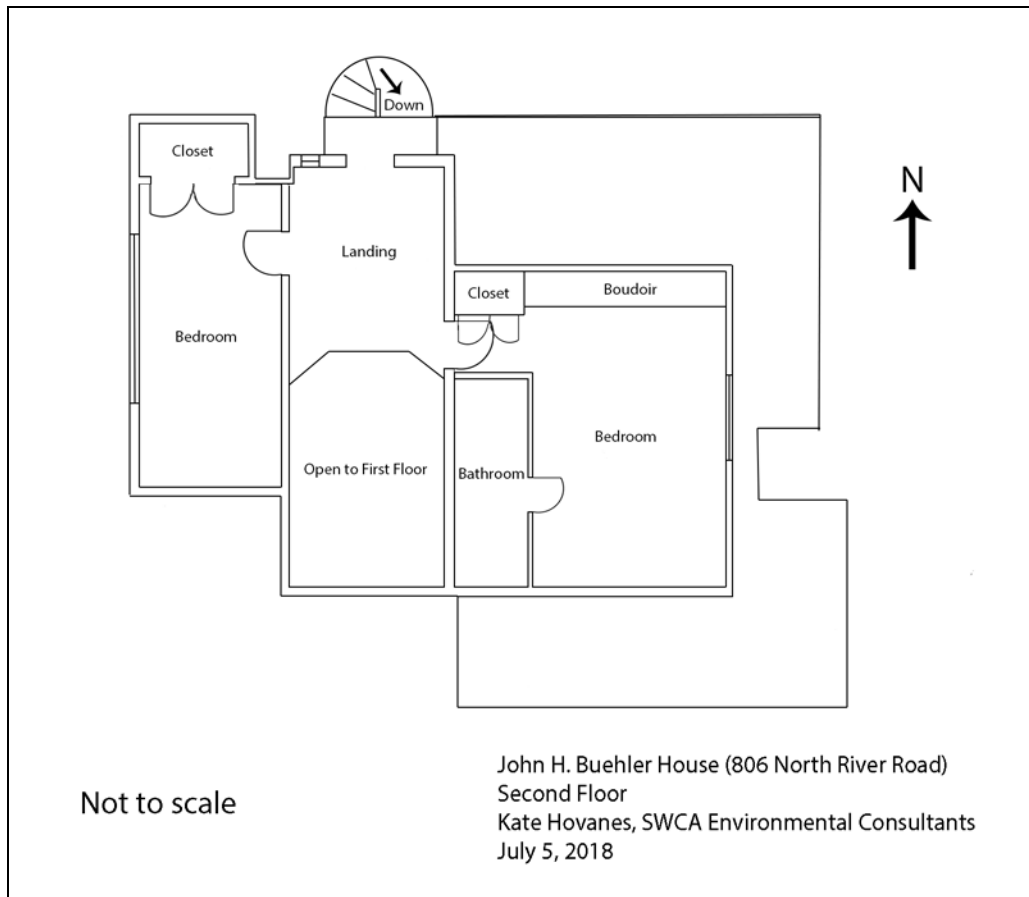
Sketch plan of Buehler House, second floor. Not to scale.
